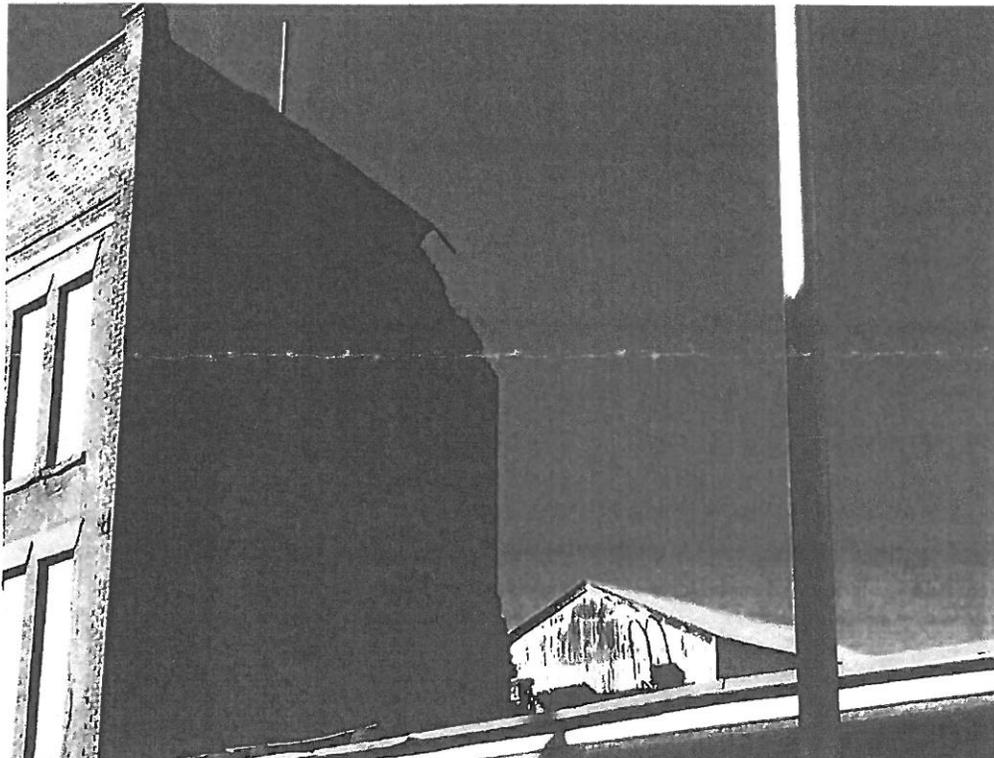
Side Elevation View of North Wall (showing the collapse of half the wall)
